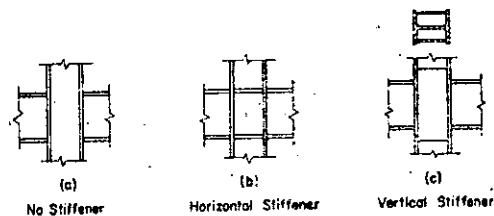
STIFFENING OF BEAM-TO-COLUMN CONNECTIONS
